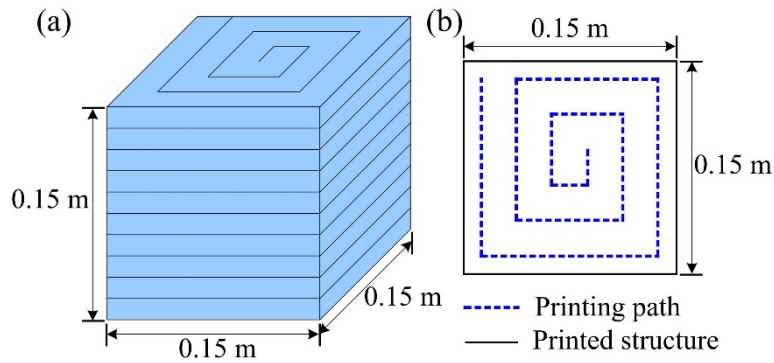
A 3D printing of specimen for density measurement laboratory tests. (a) Specimen and dimensions. (b) Rectangular rotating printing path.
